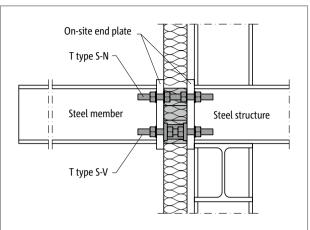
Schöck Isokorb® T Type S for cantilevered steel structures
